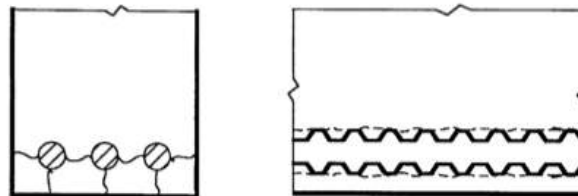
Different typologies of anchorage failure: splitting (left) and pullout (shearing) failure of anchorage systems [ACI, 2003]
